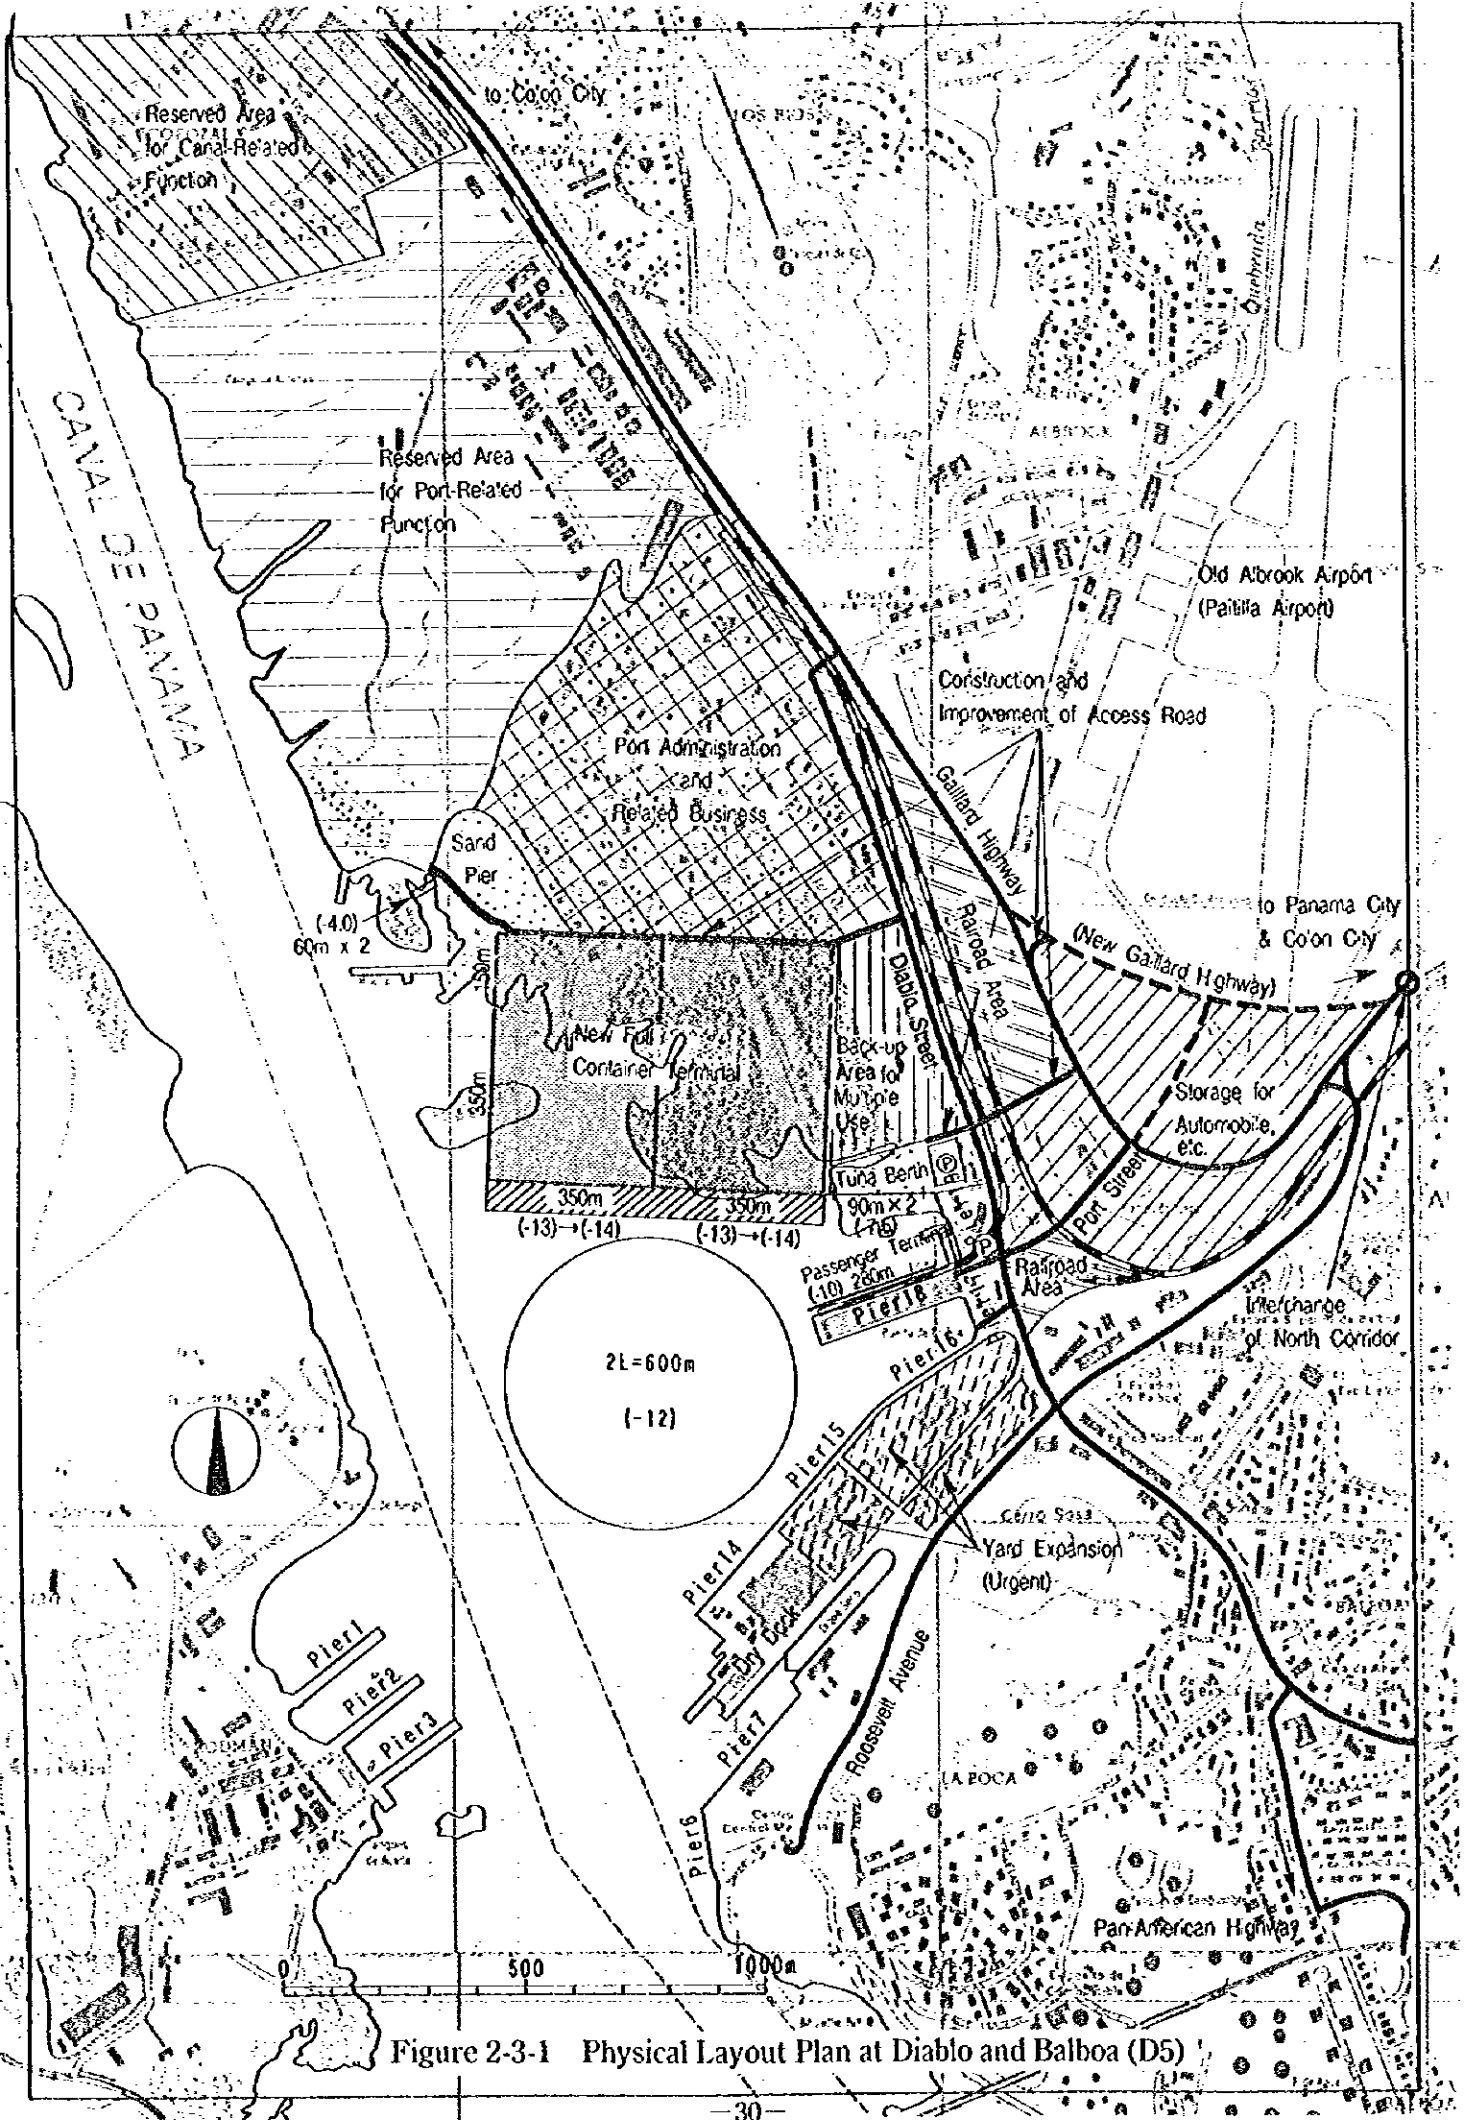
Physical Layout Plan at Diablo and Balboa (D5)
